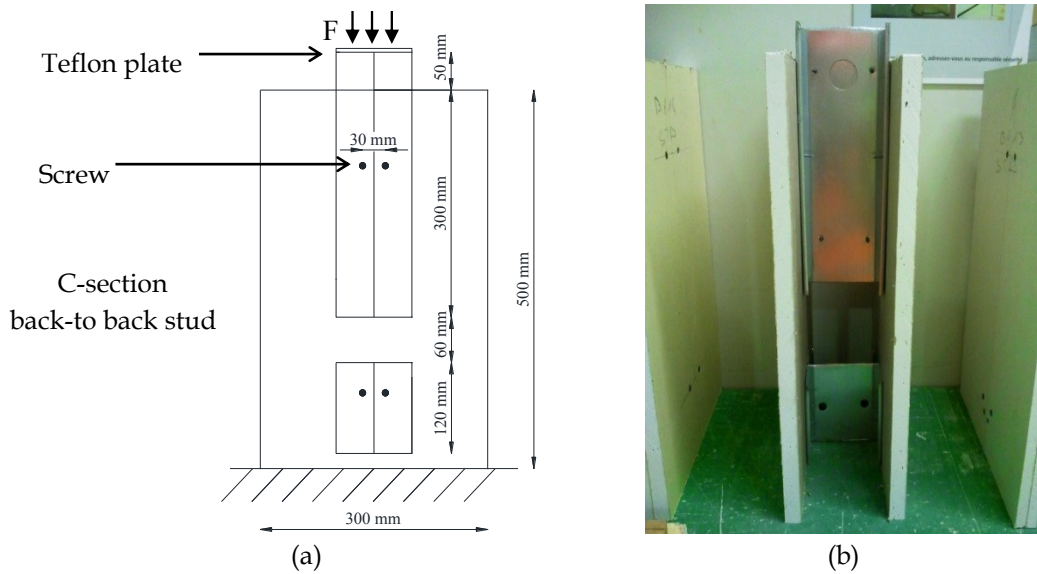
(a) Schematic view of the tested specimen dimensions (in mm) and (b) assembled specimen before testing.
